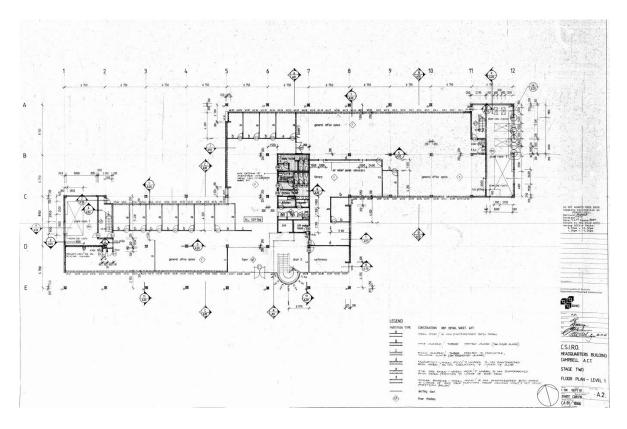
Original architectural drawings of Building 3, Level 1 (ground floor), 1981. (Source: DOMA Group)
